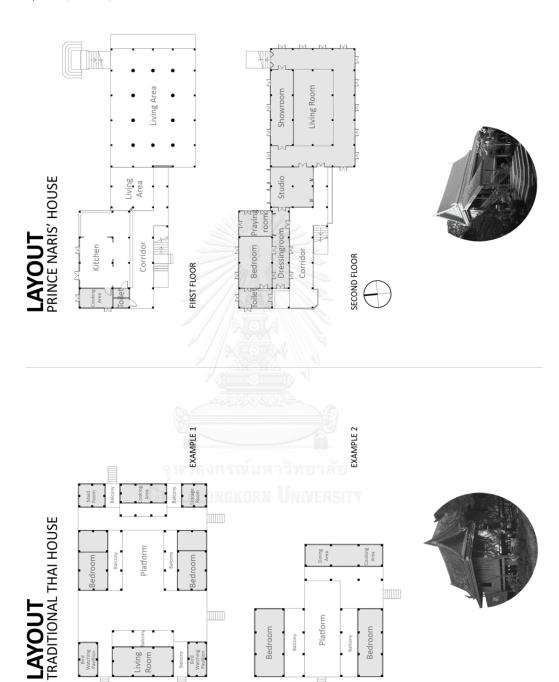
the comparison of layout between traditional Thai house and Prince Naris' house/studio. The layout of traditional Thai house is modified from Boonchu Rojanastien, ตำนานสถาปัตยกรรม เล่ม 1, 2548, pg.96. The layout of Prince Naris' house/studio is drawn by the author.
